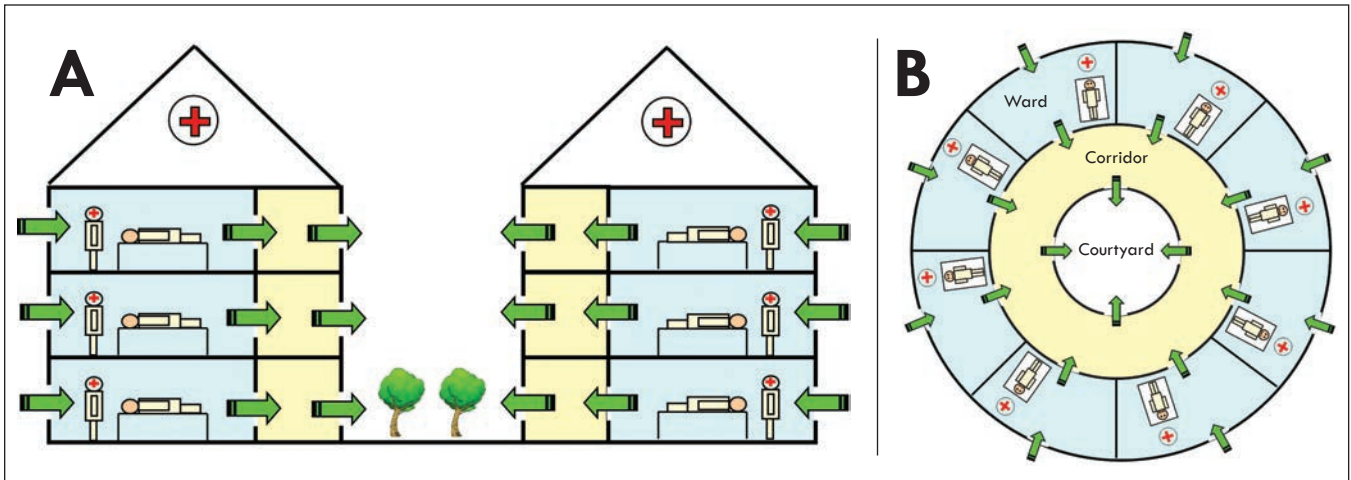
Combined wind- and buoyancy-driven natural ventilation in the courtyard type (inner corridor) hospital. A) Section plan; B) floor plan.²
